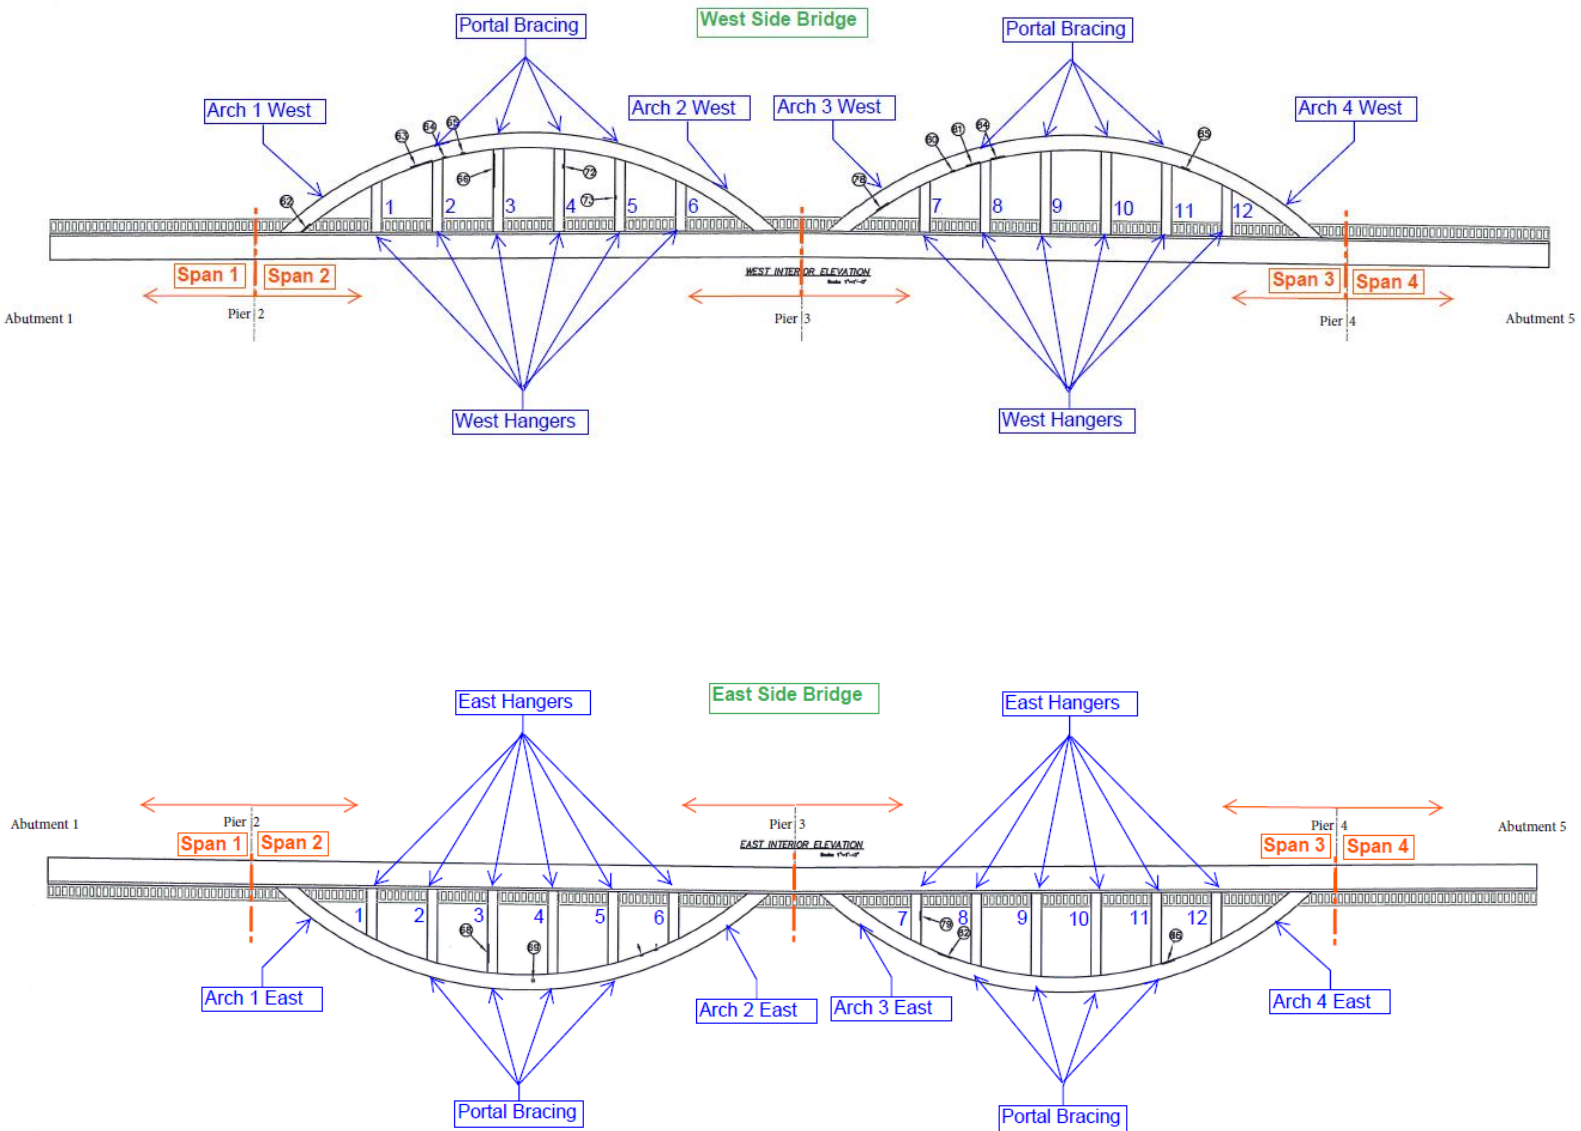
Section of bridge identifying different members and elements on west side of bridge
